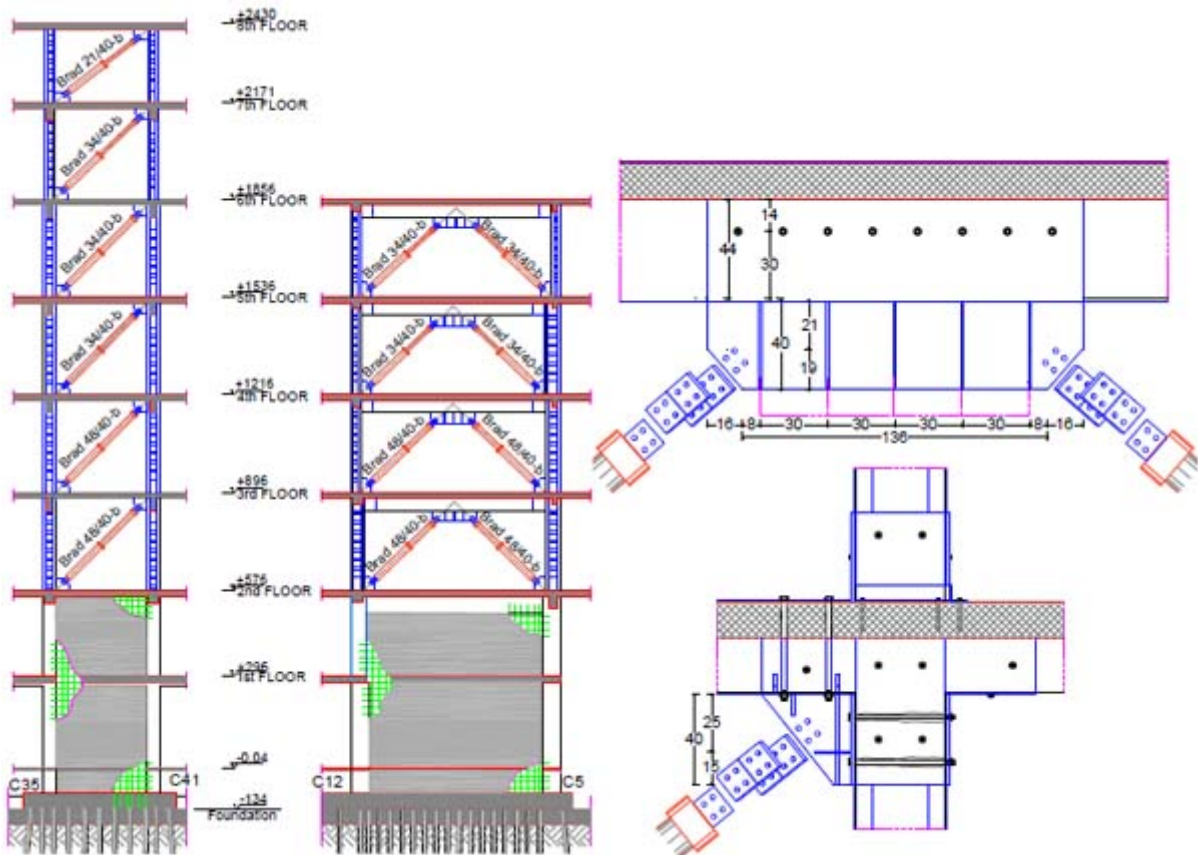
Section view of the school residential building after retrofitting with damped braces.
